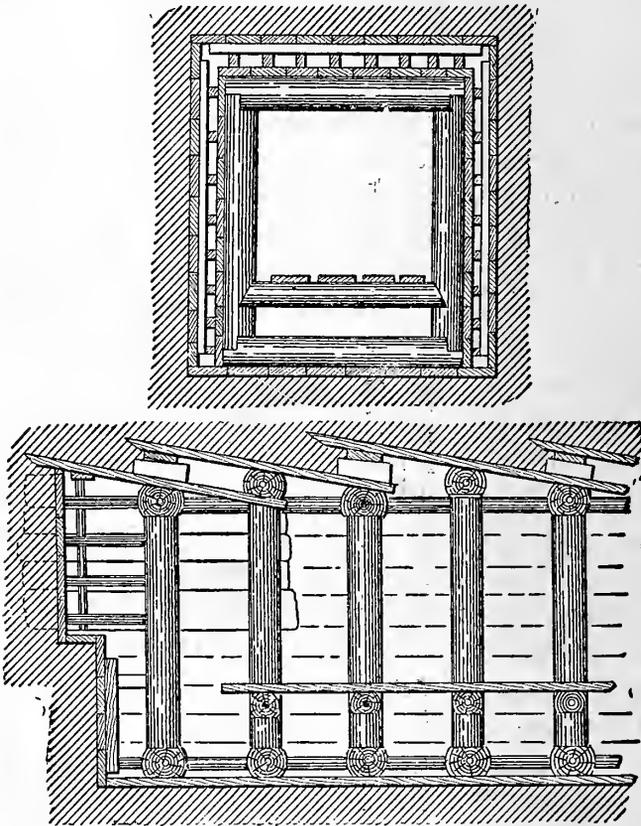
TIMBERING FOR TUNNEL HEADING.
